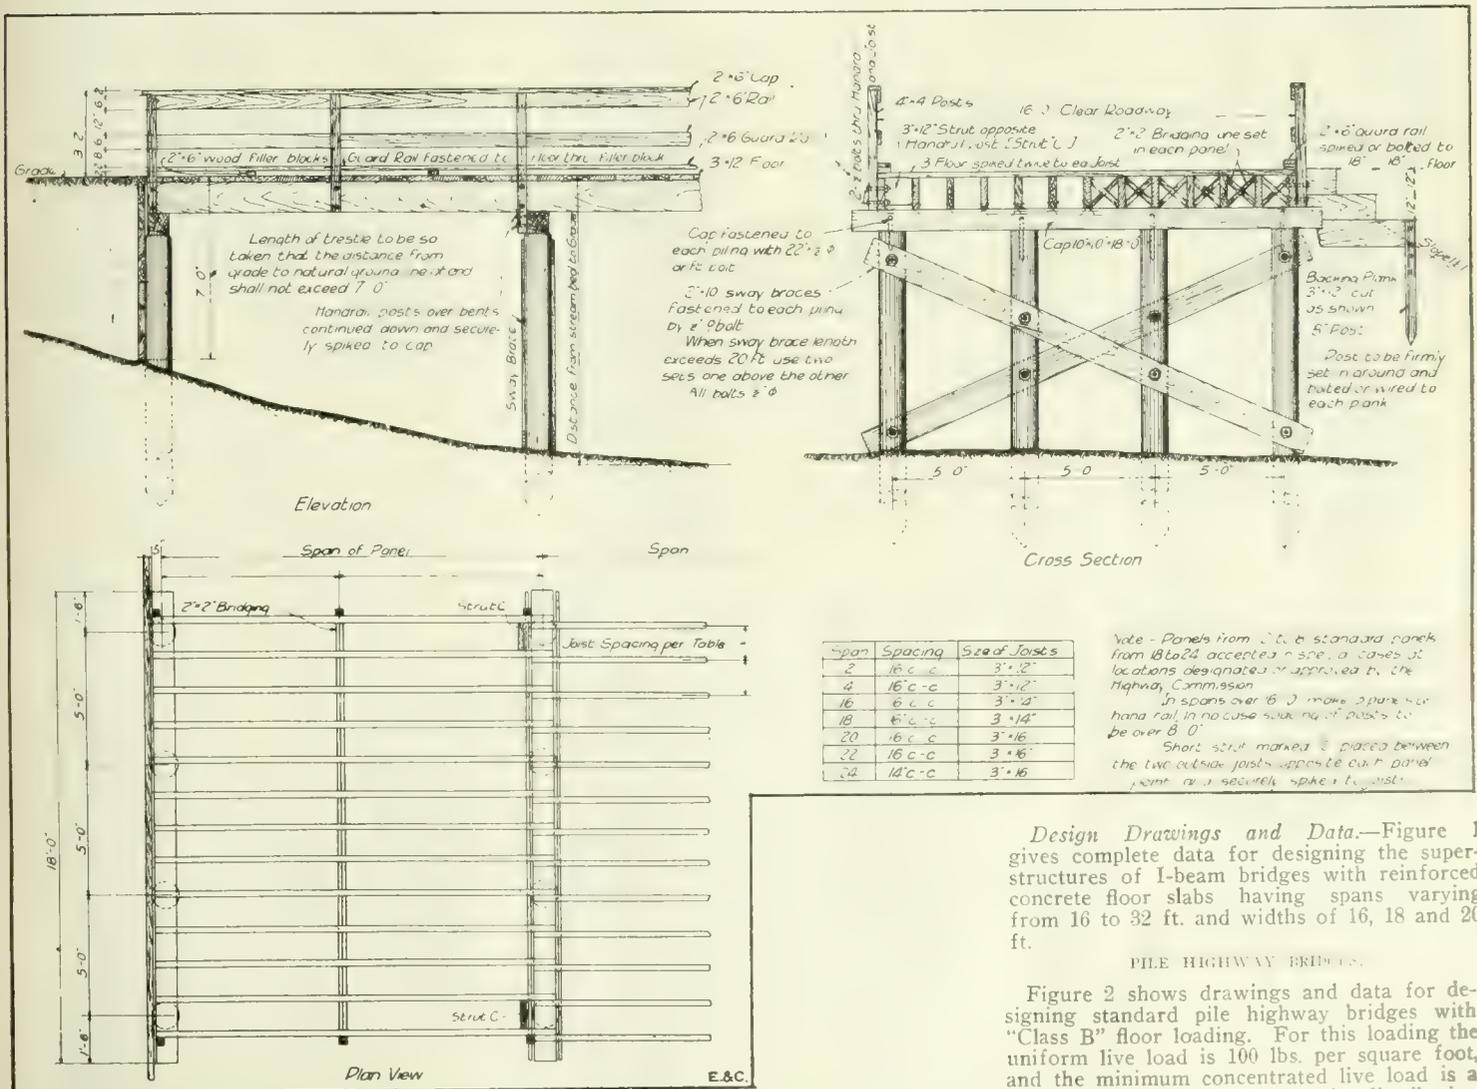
Standard Pile Highway Bridge (Class B Floor Loading) of the Iowa State Highway Commission.
